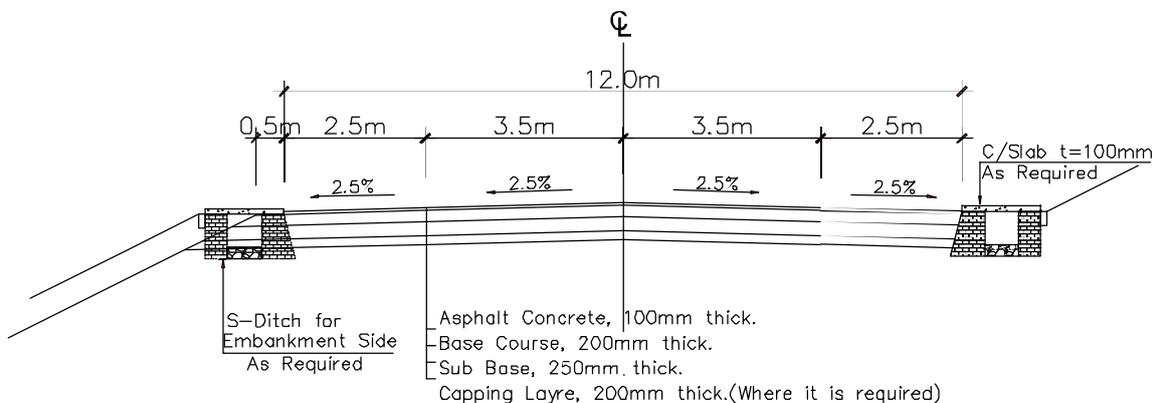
Proposed Typical Cross Section (Kebele Town & Entrance of D/M & End of Dejen)
